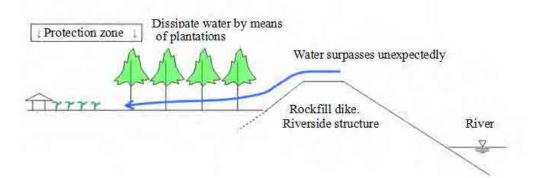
Conceptual Diagram Afforestation in the Riverside structures (A Type) (Source: JICA Study Team)
